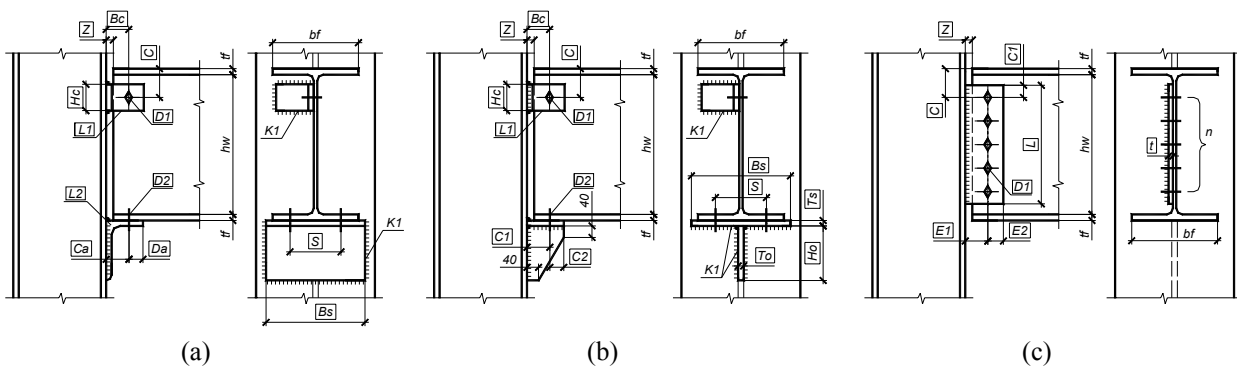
Structural designs for the pinned beam-to-column joints
